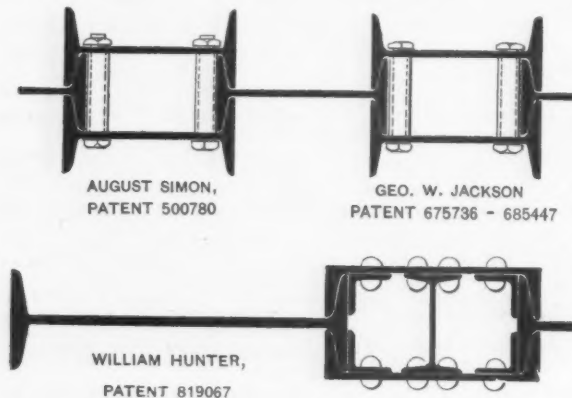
Fabricated Beam Types of Sheet Piling.
